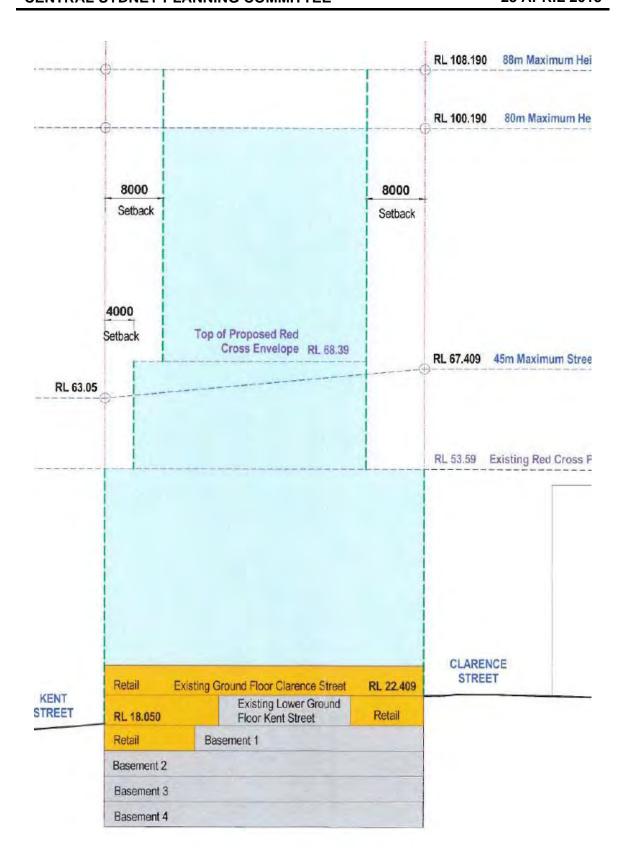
Approved Stage 1 building envelope as viewed in cross section between Clarence Street and Kent Street.
